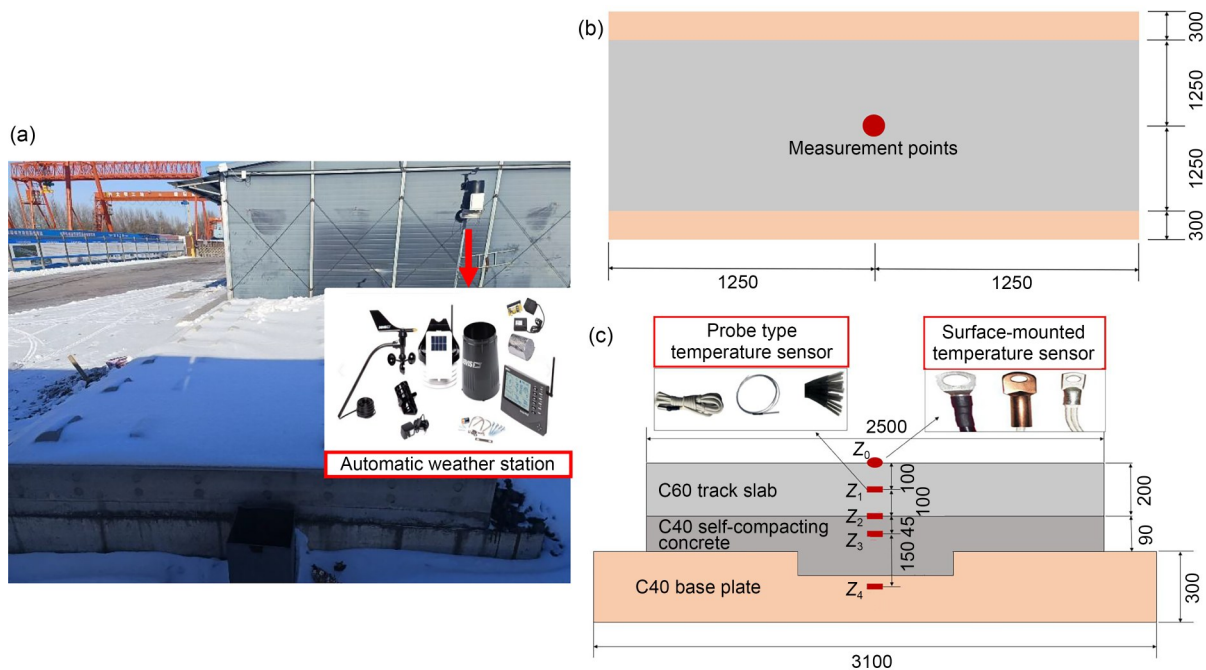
Layout of sensors for full-scale testing: (a) photo of the test site; (b) top view; (c) cross-section (unit: mm)
